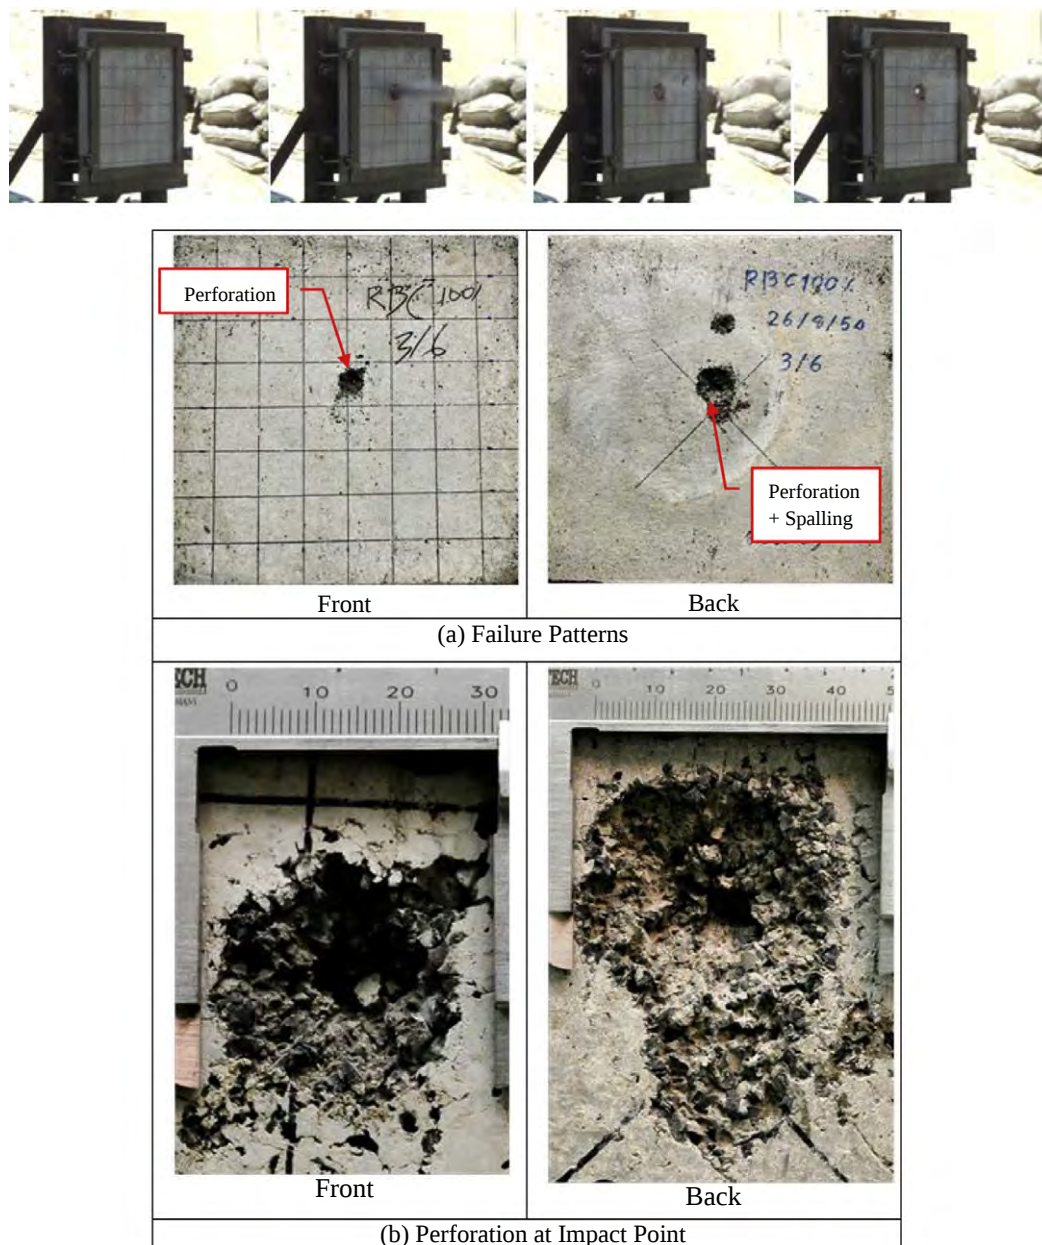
Failure patterns and impact points of single layer rubberized concrete panel. (a) Failure patterns. (b) Perforation at impact point.
